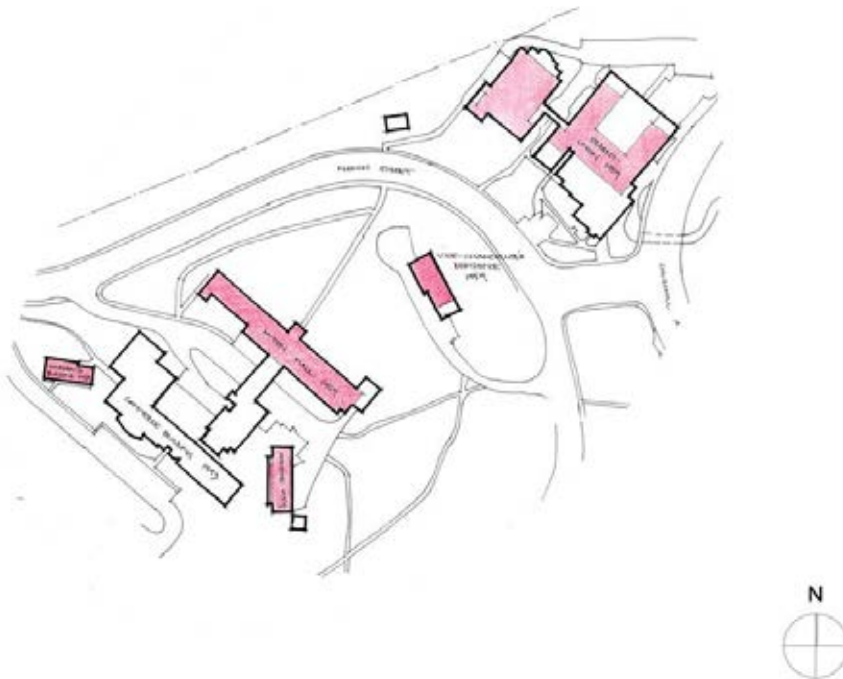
Site Plan Section 3 marking the buildings constructed to 1965 overlaid on current campus layout. Source: Paul Davies Pty Ltd
